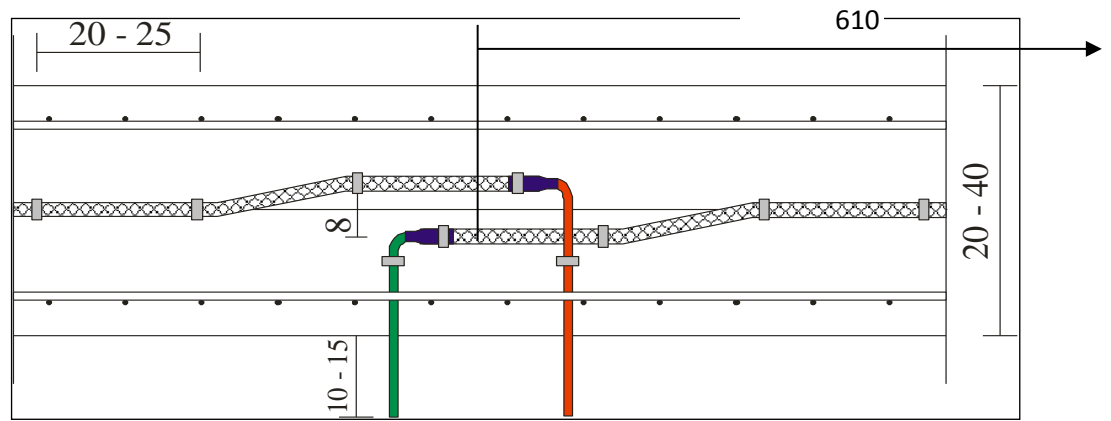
Installation scheme of the inject-system in the construction joints (cm)
